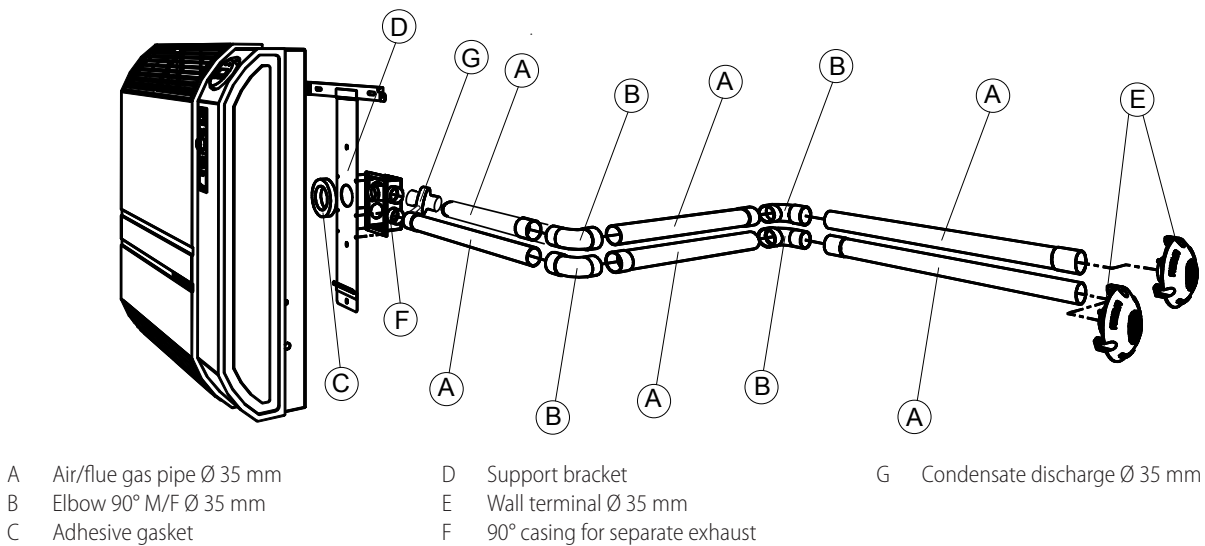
Installation with coaxial pipes with 90° outletFigure 3.4 Installation with wall separate ducts
